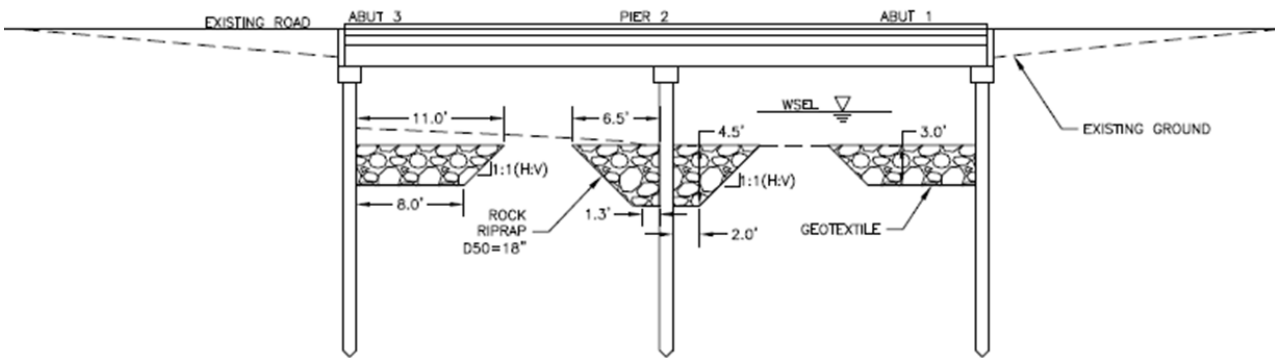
Cross-sectional view of Bridge A-24-L with recommended hydraulic scour countermeasures
